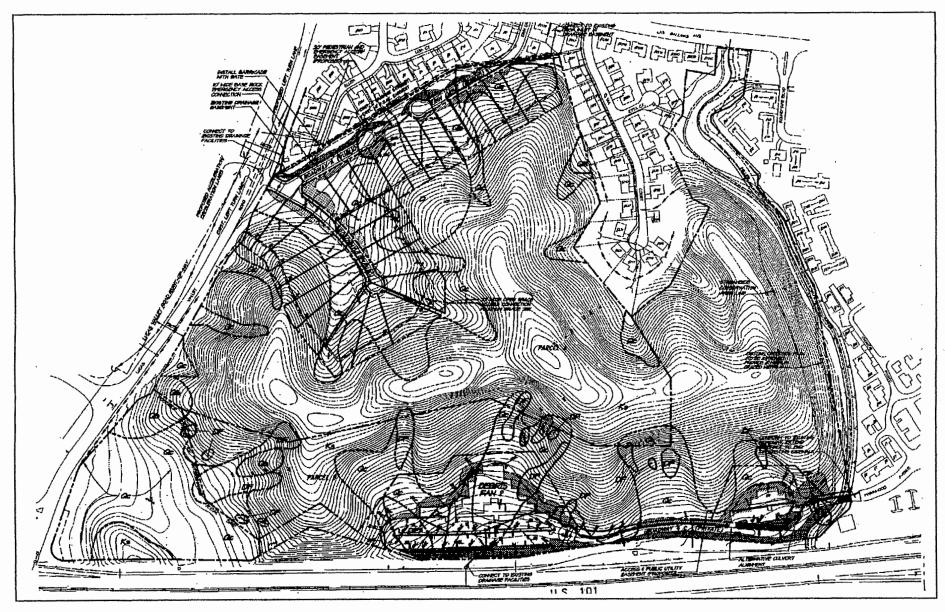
SITE GEOLOGY Oakview Master Plan
